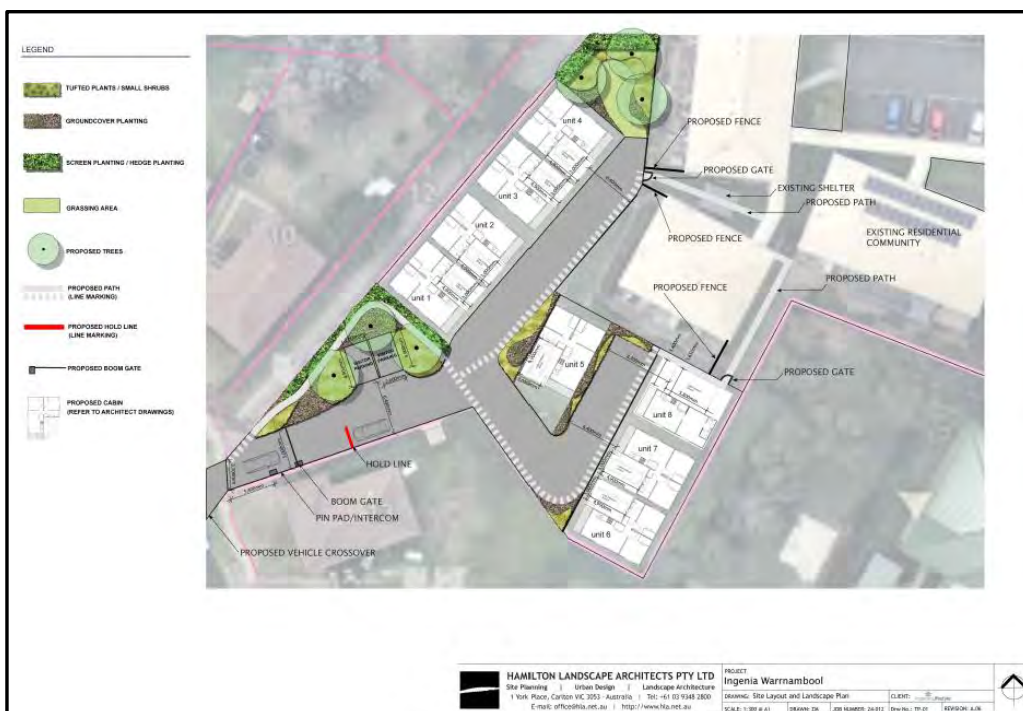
Proposed Site Plan & Landscape Plan. Source: Applicants submission
